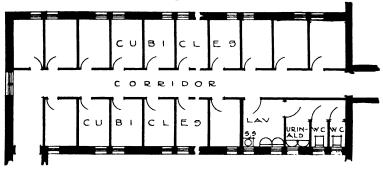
Plan showing arrangement of cubicles for a man's hostel or common lodging-house.
